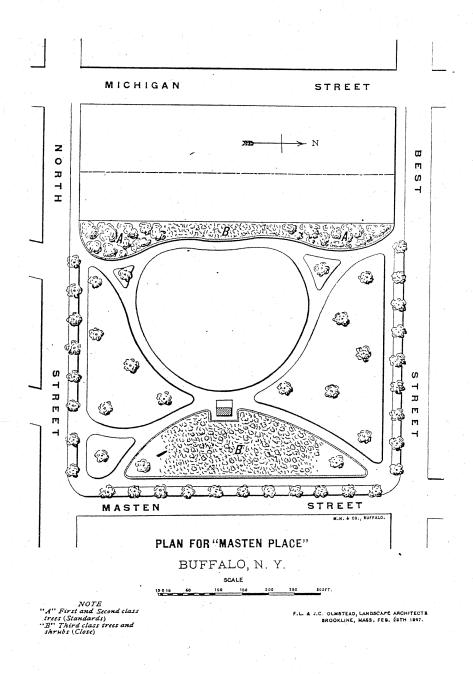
Plan for Masten Place, Buffalo, N.Y., F.L. & J.C. Olmsted, Landscape Architects, Brookline, Mass. Feb. 28th, 1887. Courtesy Beveridge collection.
